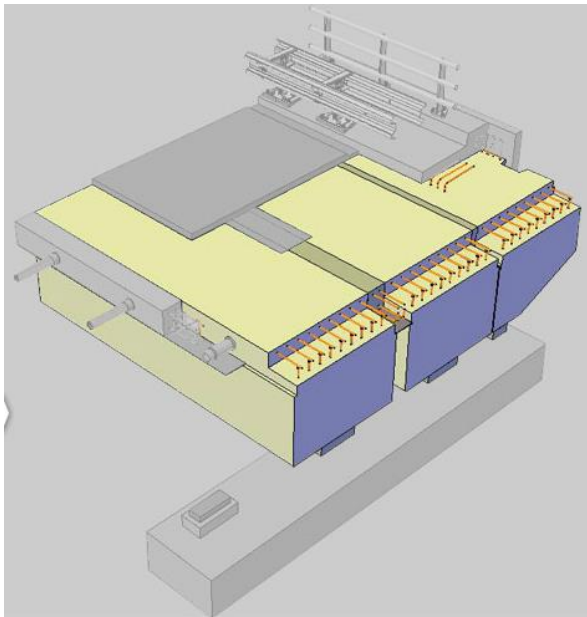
, SKK beams from [Spanbeton.nl](http://Spanbeton.nl)
